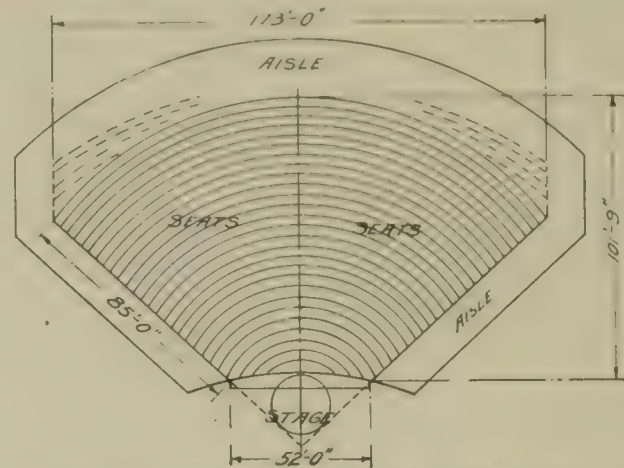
FLOOR PLAN, NATIONAL OPERA HOUSE, PARIS.
